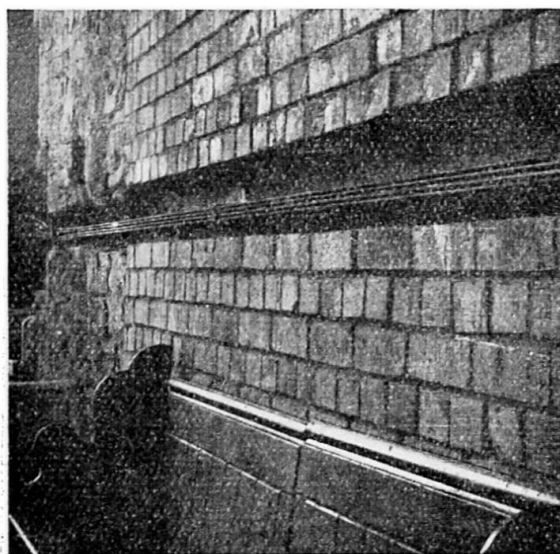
Chase in the inner wall, where the opening had been bricked up.
